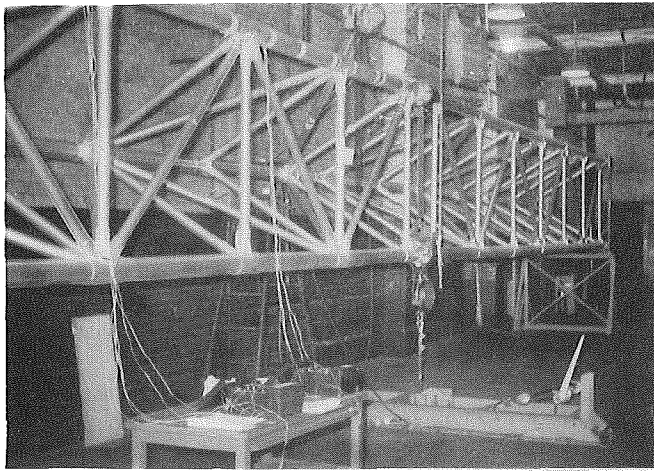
60-ft. plastic fiberglass truss loaded at center span in the vertical plane position with load applied on one side.
